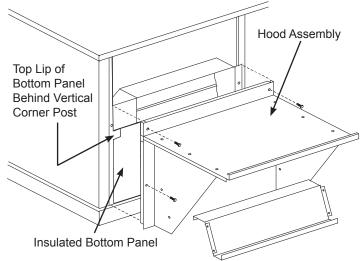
Installing OA Hood and Damper OA2-SRT12/34 Shown
